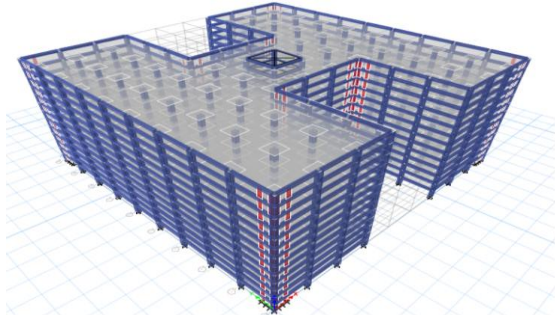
3D model for flat slab without drop with 250 mm concrete shear wall
